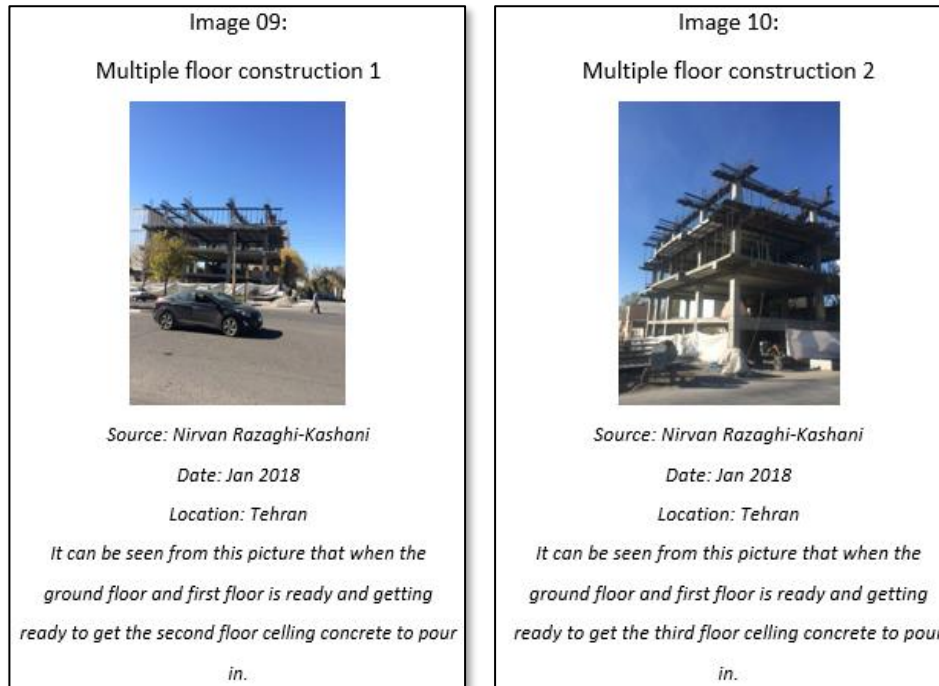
Images of columns and beams in the structural framework on a building in Tehran, (source: Nirvan Razaghi-Kashani).
